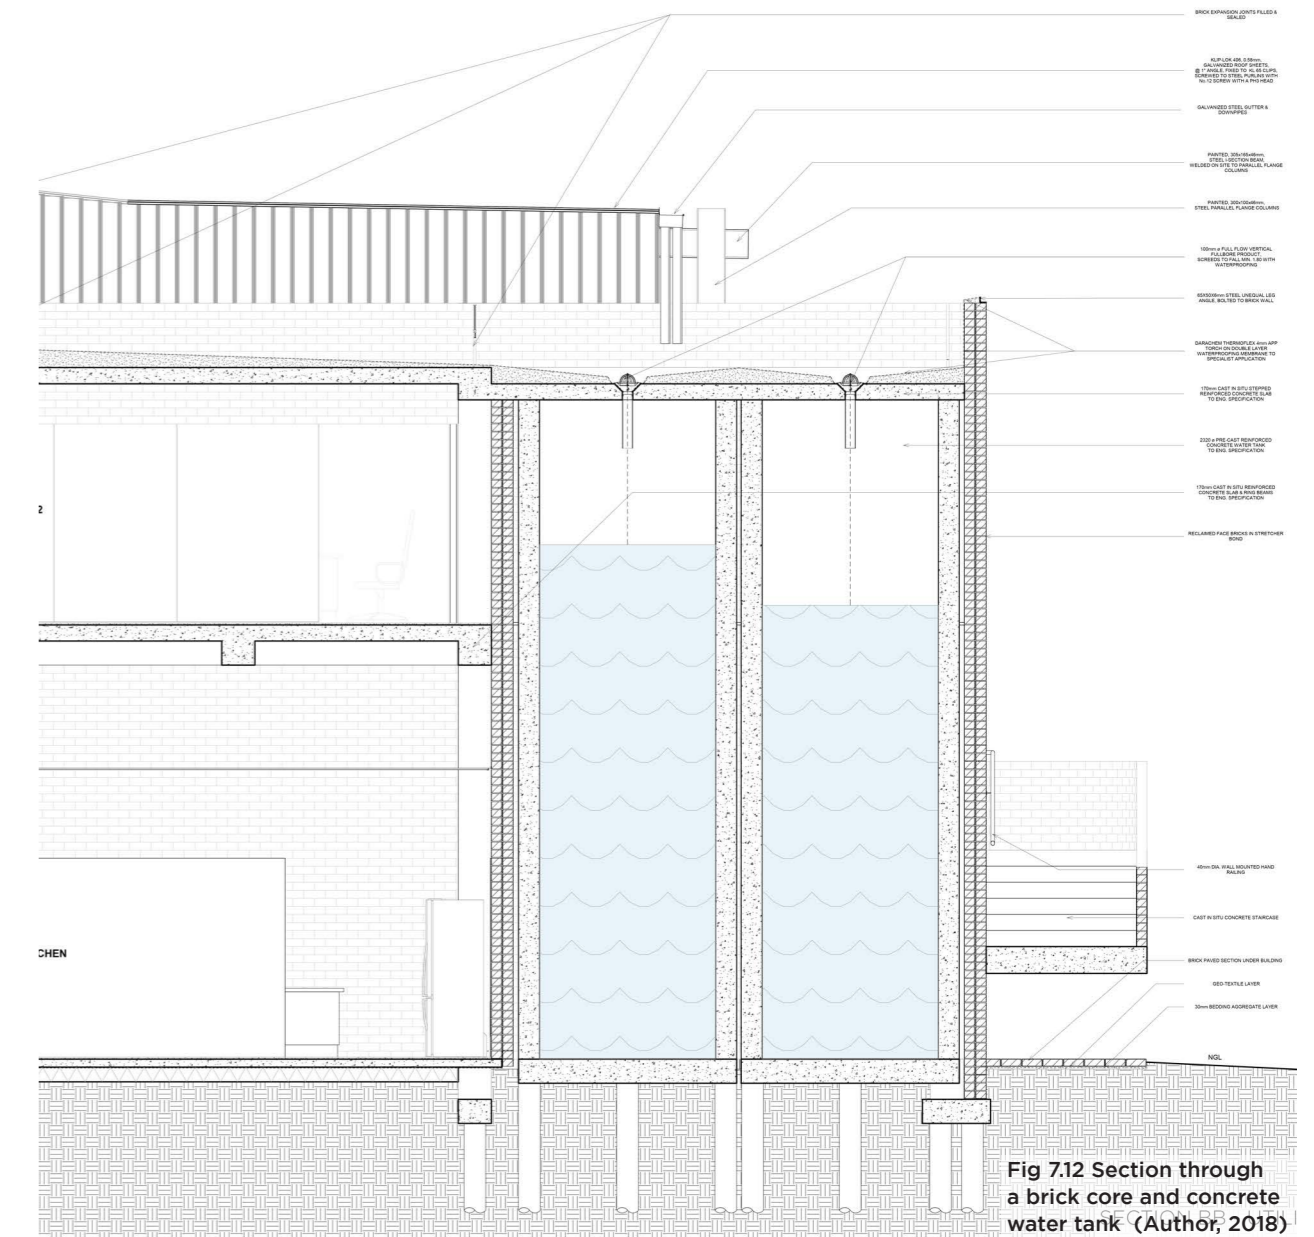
Section through a brick core and concrete water tank (Author, 2018)
